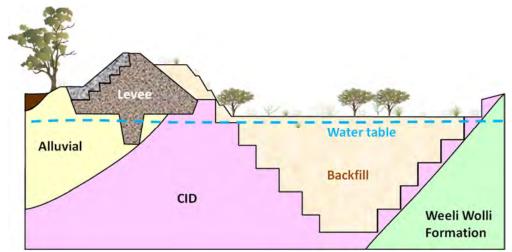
Schematic representation of backfill supporting the pit wall adjacent to a creek.
